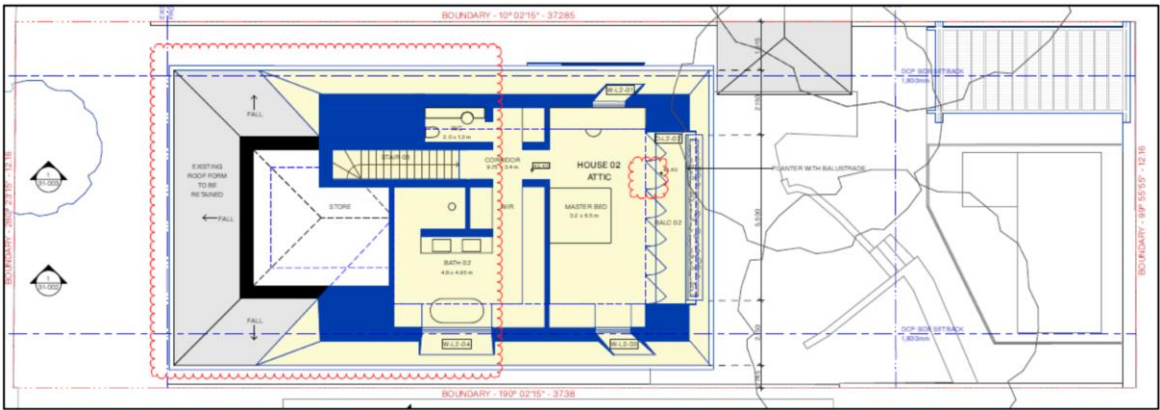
Level 2 / attic level plan - 10 Moore Street (Source: Tribe Studios)
